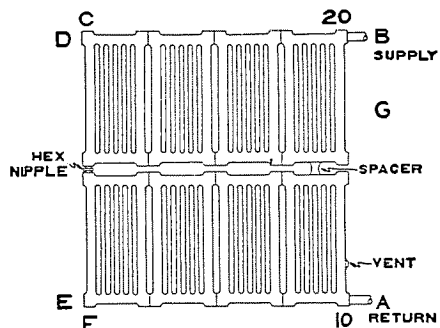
Eight Sections in Two Tiers—Two-Pipe Steam Using Spacing Saddle
